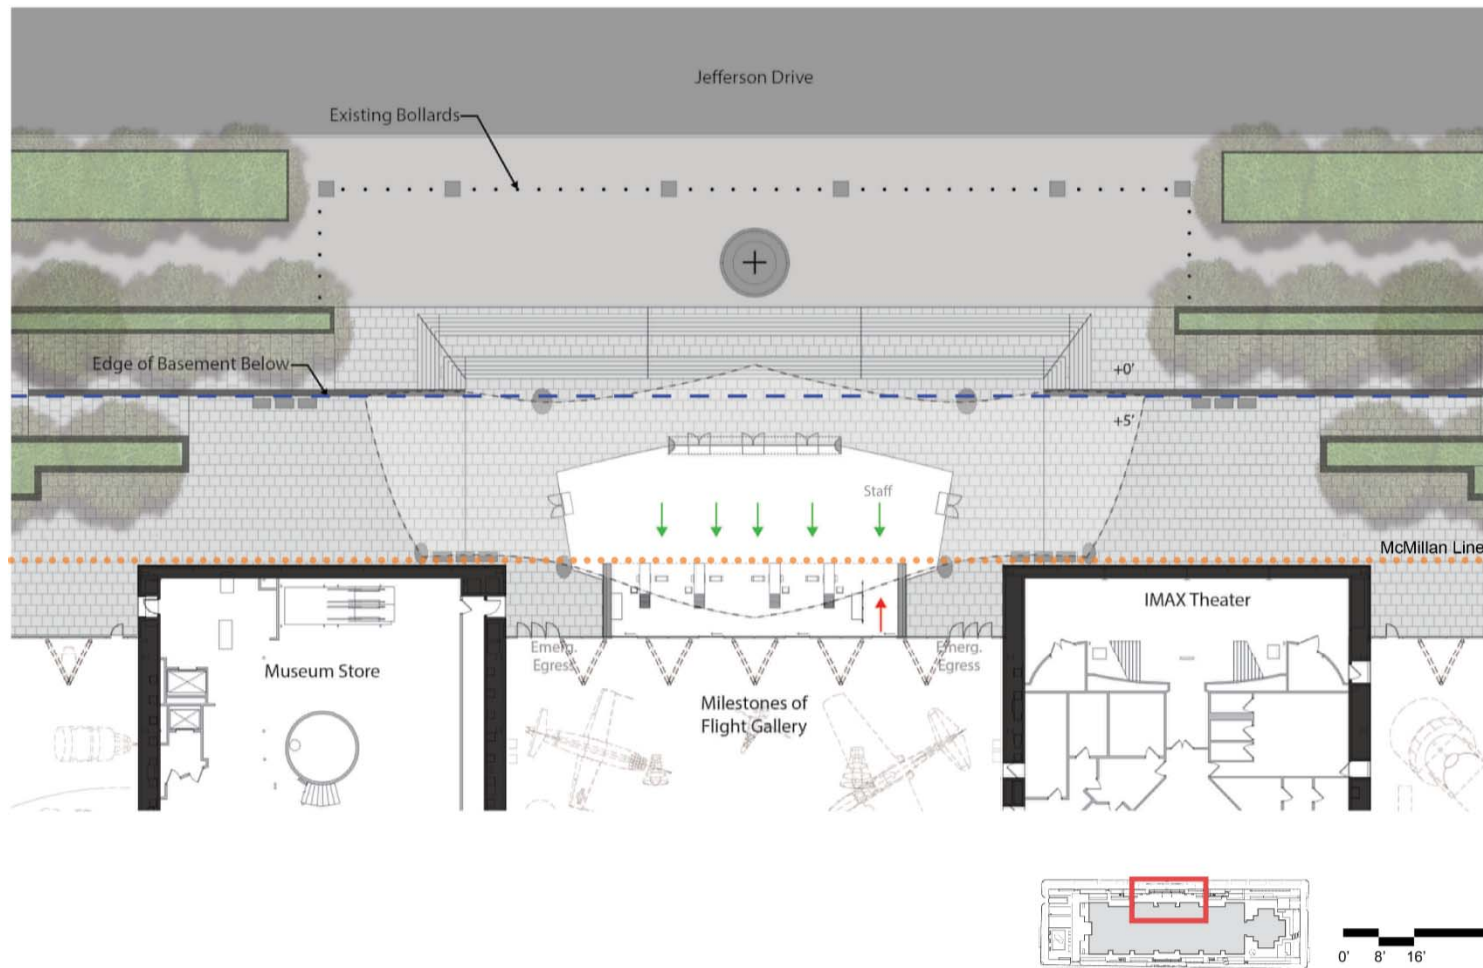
10: North Vestibule Design 'A' Floor Plan.(Source: QEA.)
